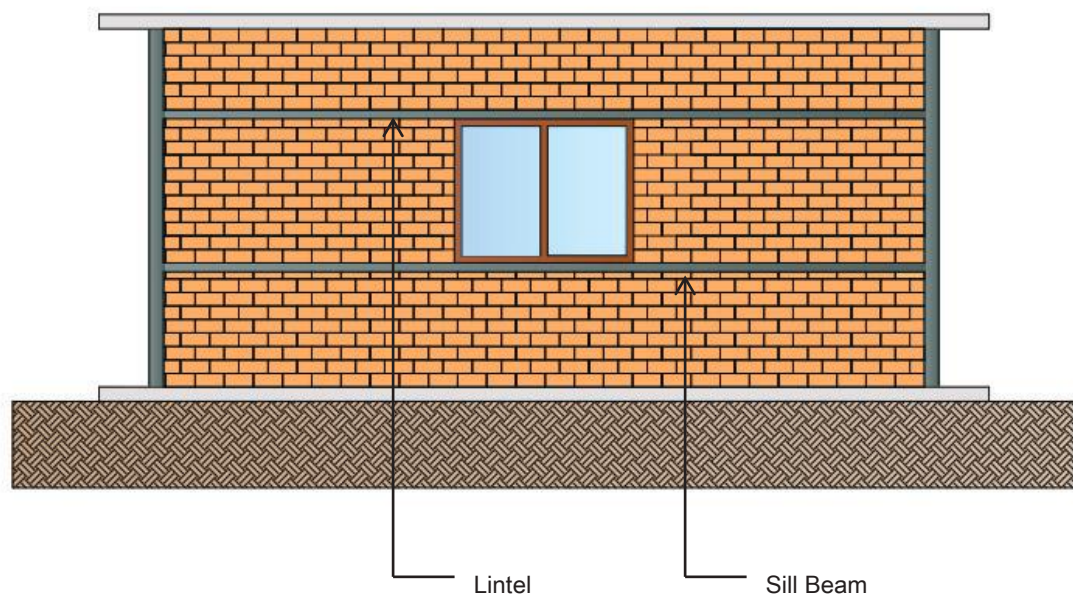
Wall Opening Supported with Lintel/Sill Beams
